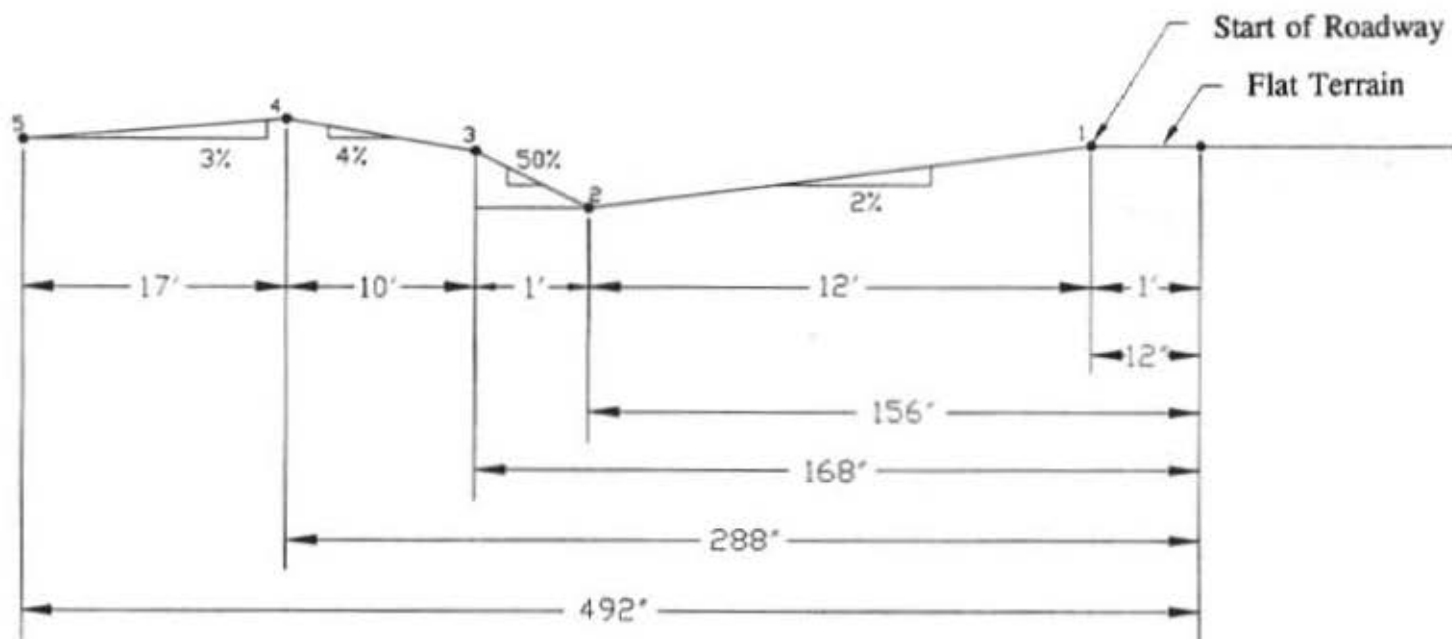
6-in. Lip Curb and Roadway Cross Section
